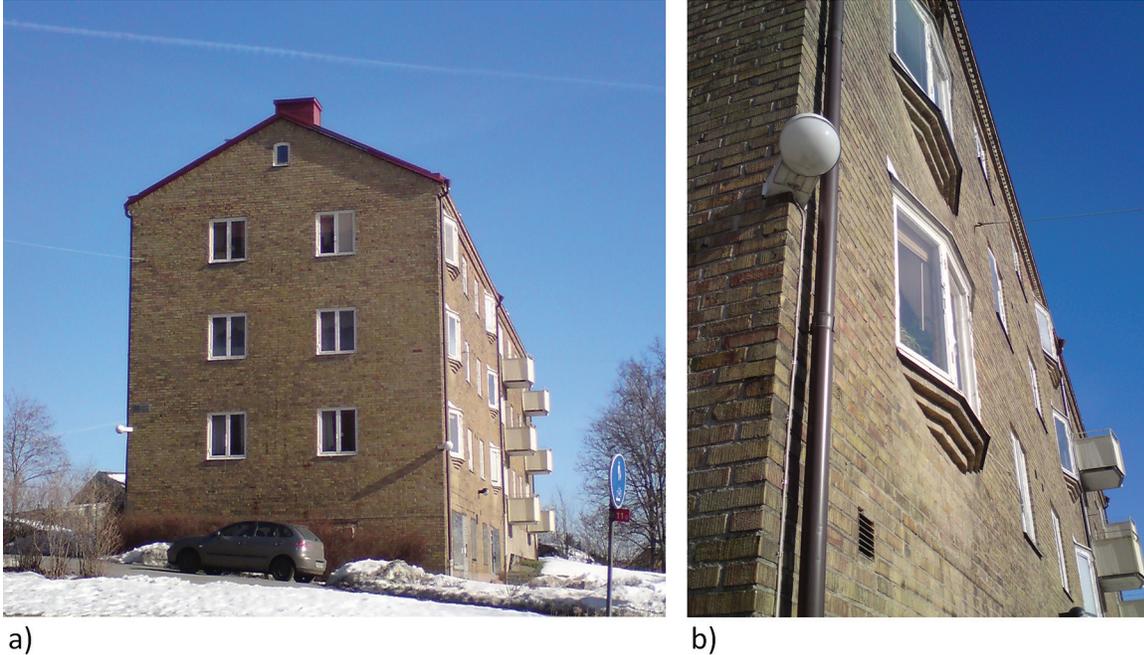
The investigated building before retrofitting (photos taken early March 2010): (a) west façade with gable and (b) details of the south façade's bay windows.
